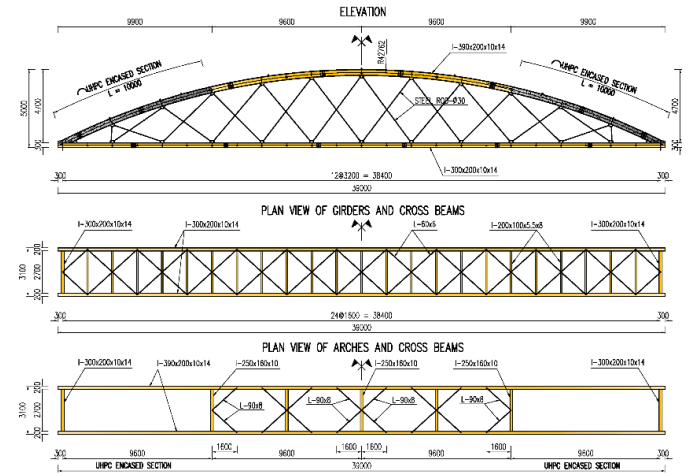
General arrangement of steel structures: arches, girders, and cross beams
